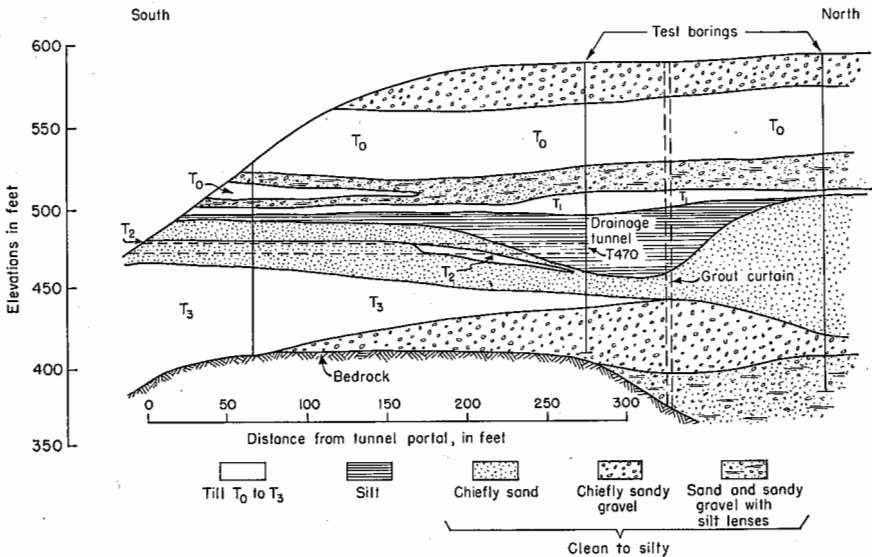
GEOLOGICAL SECTION THROUGH GLACIAL AND FLUVIO-GLACIAL DEPOSITS. The deposits occupy the space between a grout cutoff and a steep slope downstream from left abutment of a concrete gravity dam.
